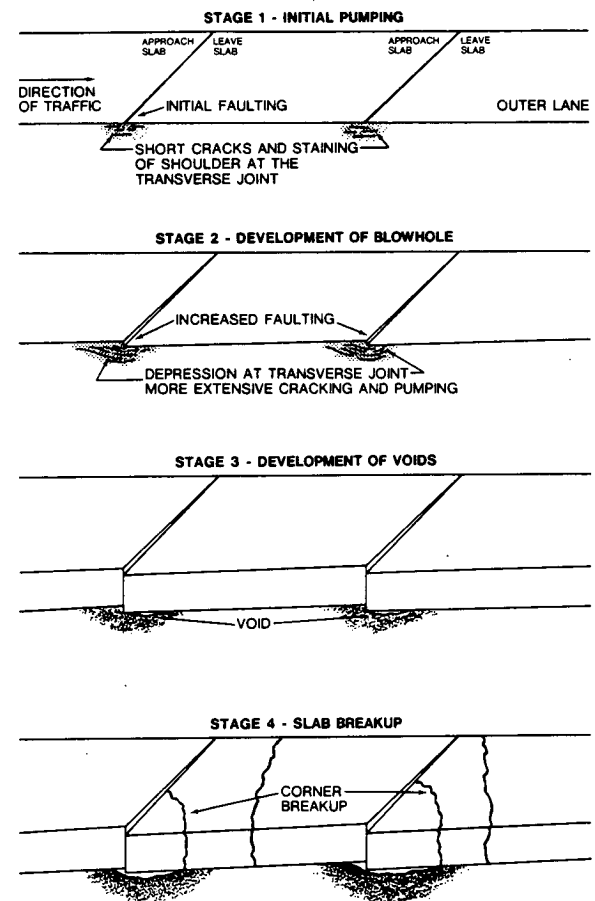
Typical stages in the deterioration of a concrete pavement.
